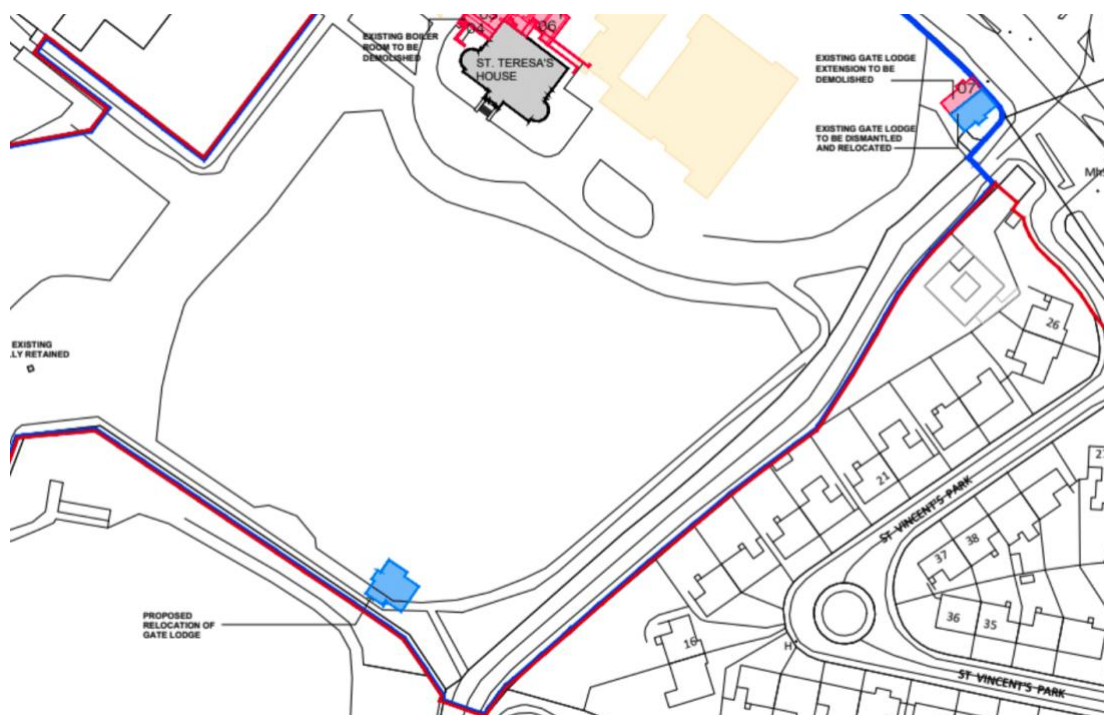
Site Plan of Gatelodge Relocation Proposal
